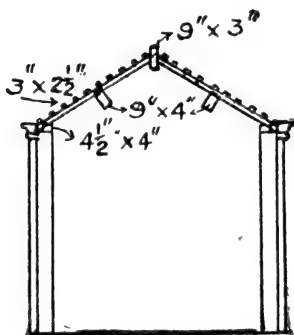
Meter and Governor House: Roof, Cross Section.
